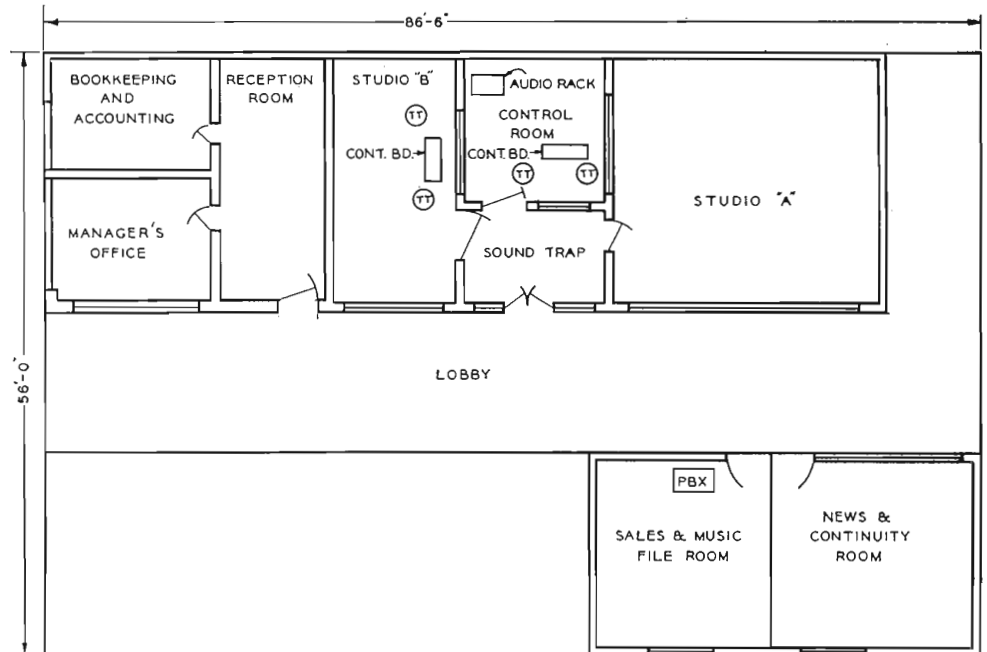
(above). KVFD/KFMY studio floor plan layout for two studios and control room.
